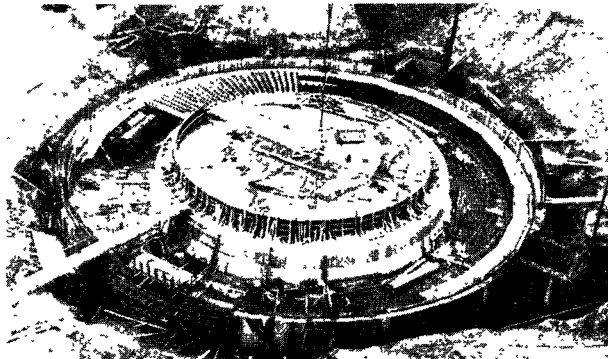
Construction of the foundation for the first vessel, in a battered excavation 25 ft deep. The central mass foundation is encircled by the wall of the lower stressing gallery. On the further side can be seen the first of the precast beams from which the helical stressing system starts
